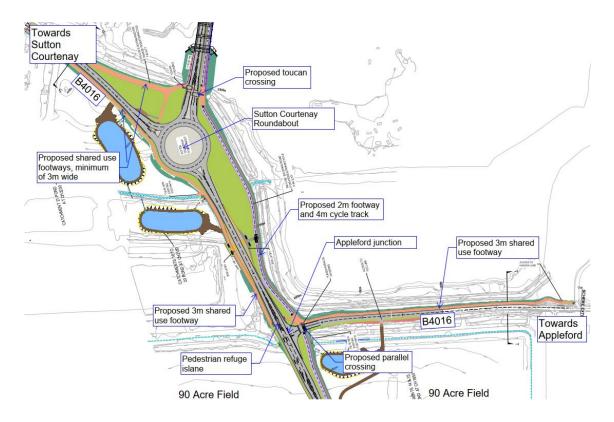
Proposed road layout and NMU facilities over 90 Acre field and Sutton Courtenay Roundabout
